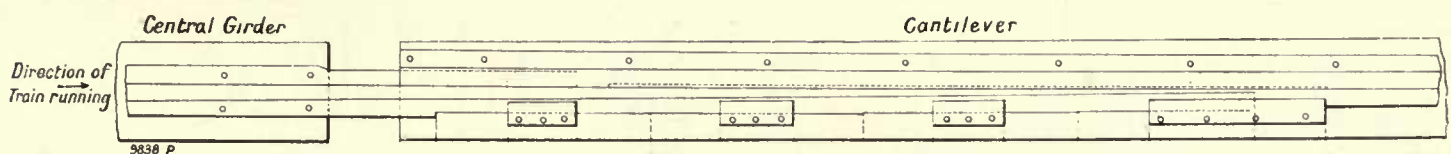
EXPANSION JOINT FOR RAILS AT ENDS OF CENTRAL GIRDERS; INCHGARVIE, NORTH AND SOUTH.
